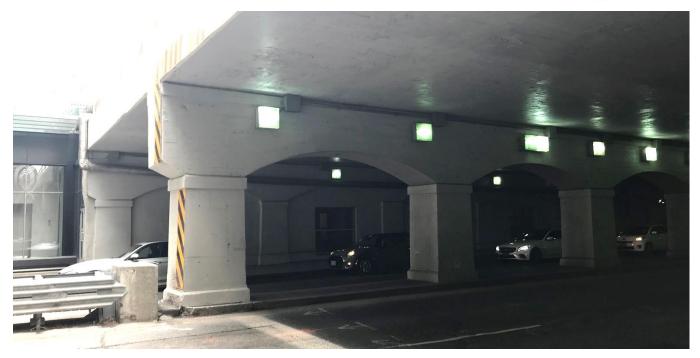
Photo of the central columns and segmentally arched openings on York Street.
